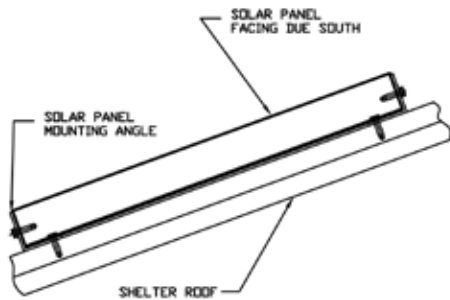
MOUNTING PV ON SHELTER ROOF
